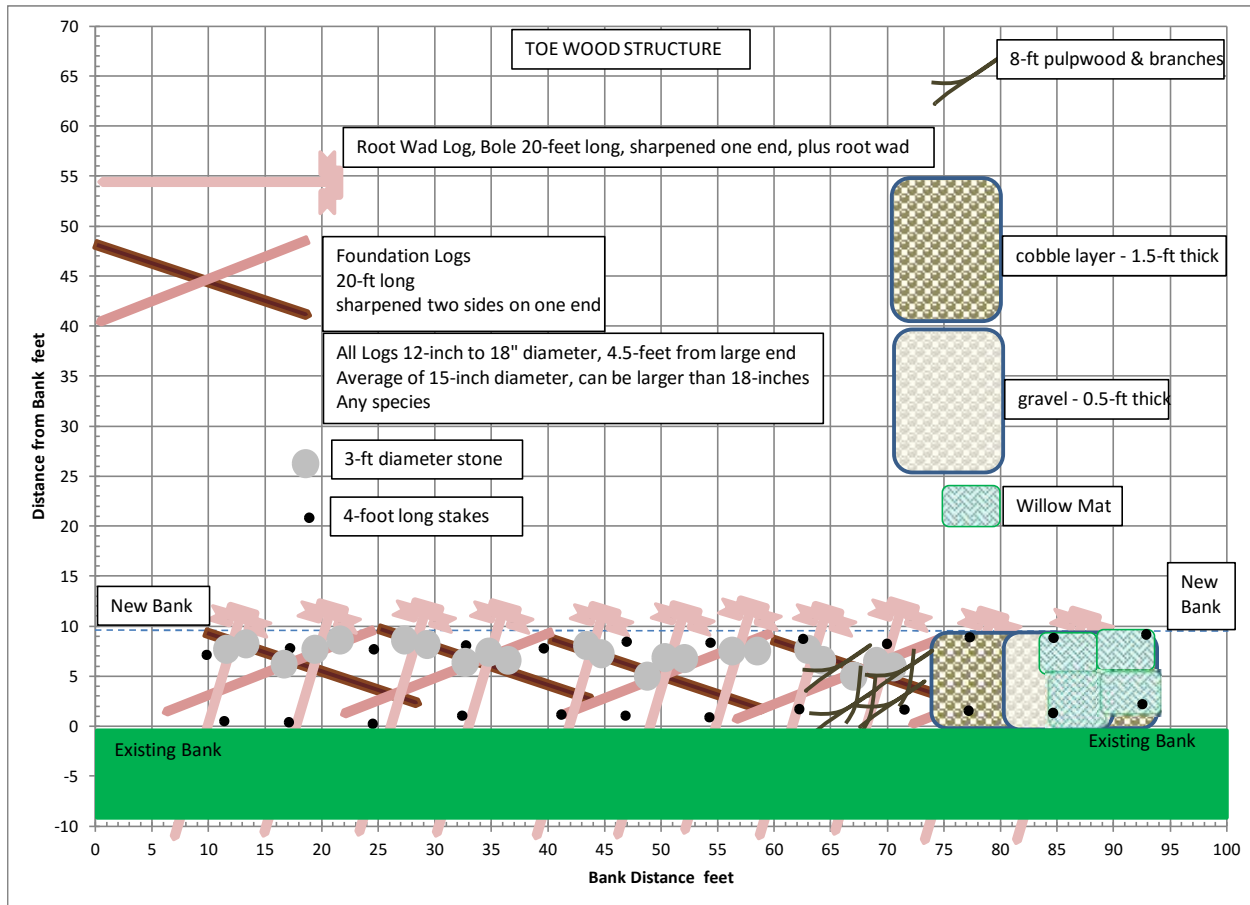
Plan view of the toe wood structure showing progressive layers (left to right). Note, width of toewood bench landward of the root wad is 10- feet.
